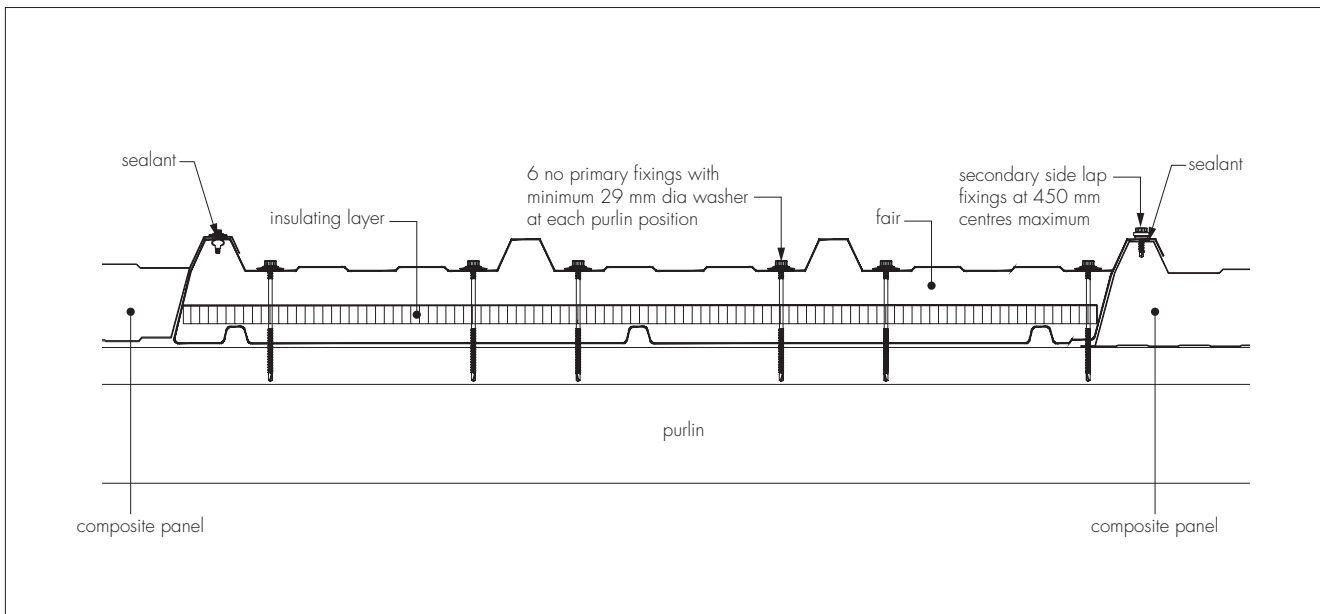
Fixing detail for factory-assembled rooflights (cross section)
